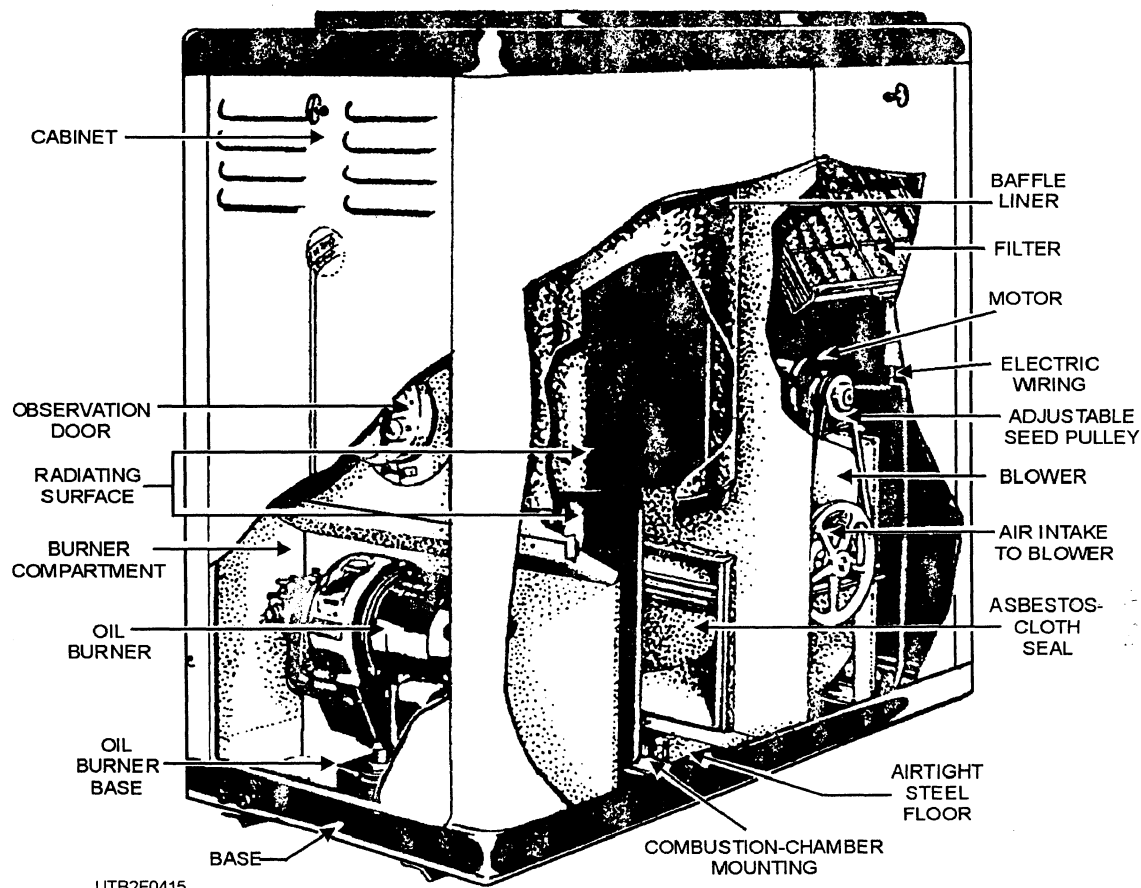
Cutaway view of a typical oil-designed furnace.
